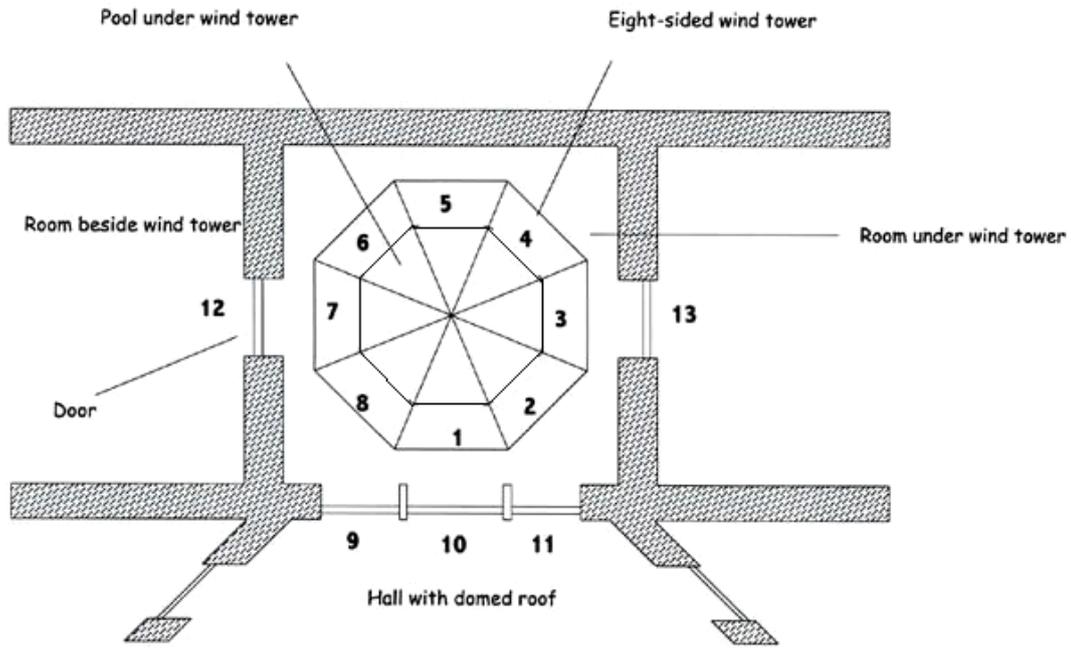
Plan of Dowlat Abad garden wind catcher
